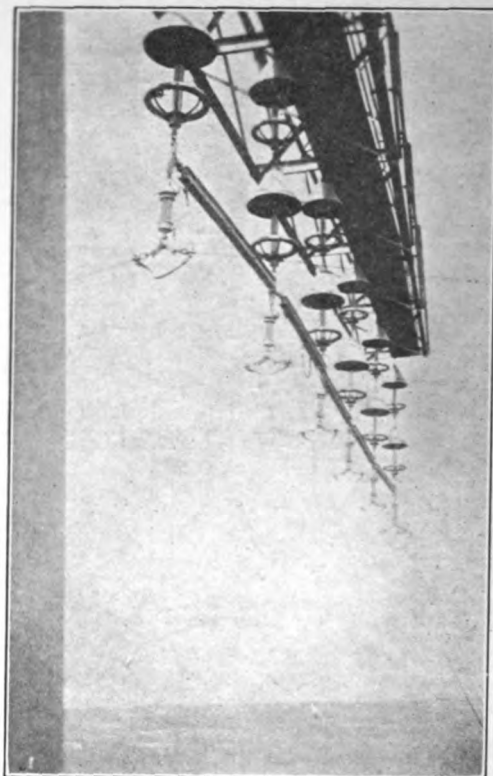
Photograph of the Assembly Shown in Figure 11 as Actually Installed.
